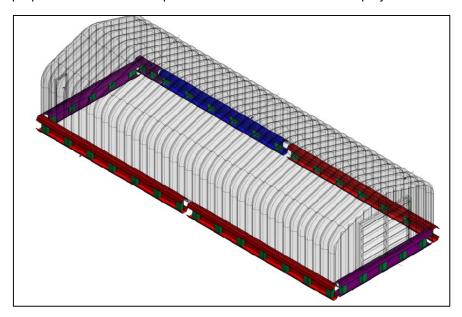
Schematic view of proposed new Interim Waste Management Facility
